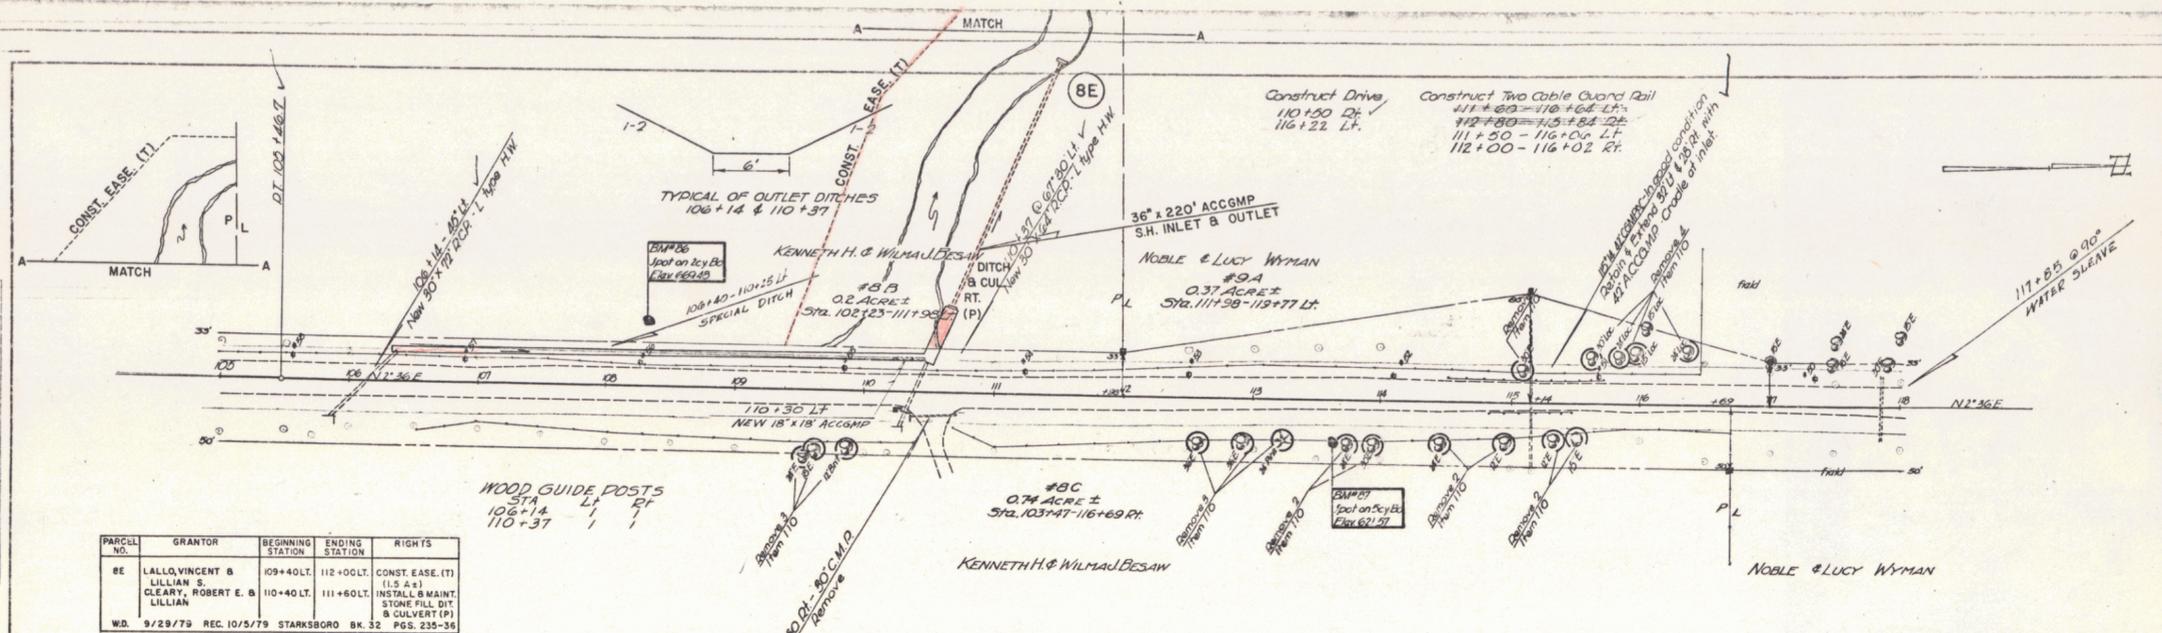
PLAN - PROFILE - P. O. & S. ENGINEER
